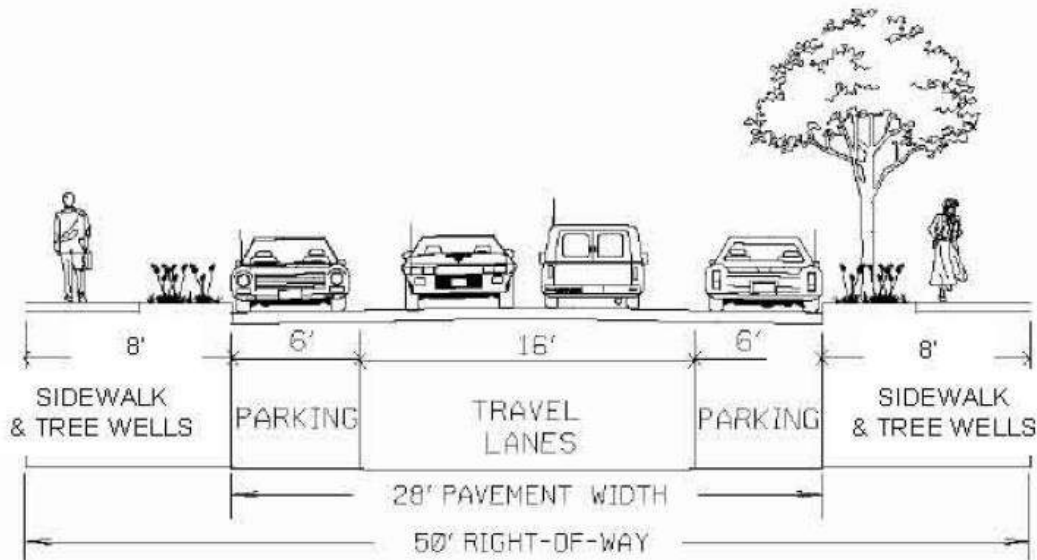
Existing Cross-section Standards for Local Roadways.
